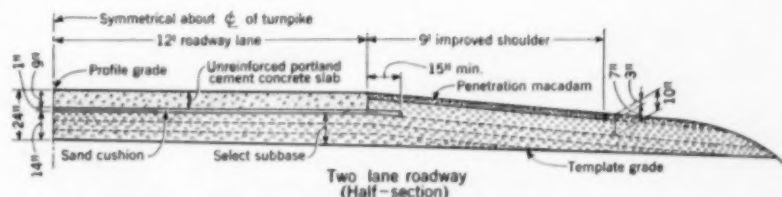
Pavement consists of unreinforced concrete slab 9 in. thick and 24 ft wide, with sawn transverse joints at 18-ft spacing, laid on sand cushion over 14 in. of rolled crushed sandstone base. Penetration macadam shoulders are each 9 ft wide, 3 in. thick, on sandstone base.
